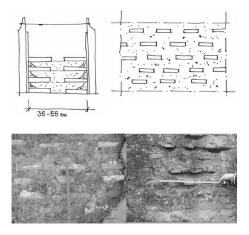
Details of Type III-wall. Detail of the elevation of Convent of San Diego, Alfara Patriarca, Valencia; detail of the elevation of the fencing, Carabona Tower, Burriana (authors).
